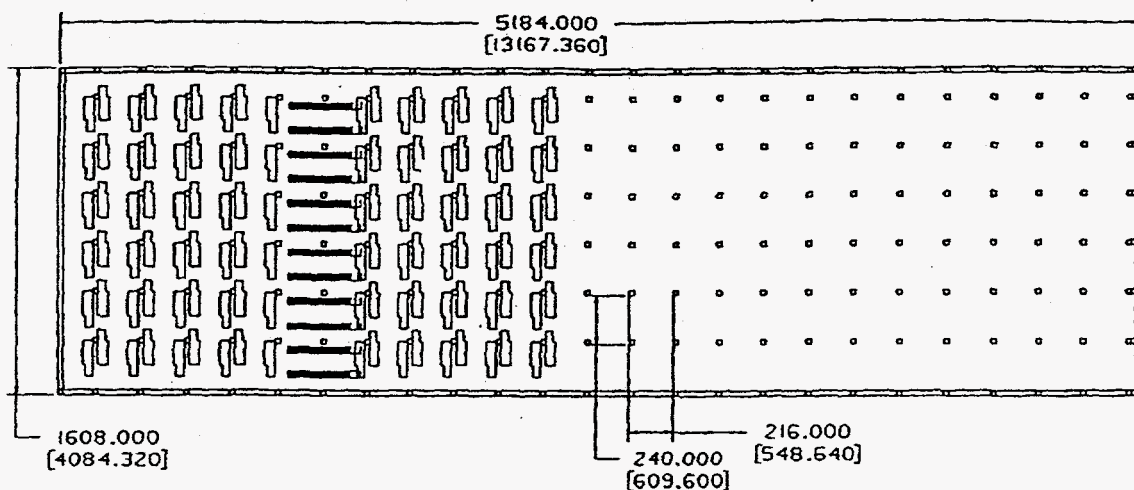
A Plan View of the Ground Floor The Wide Black Lines are Stairwells
